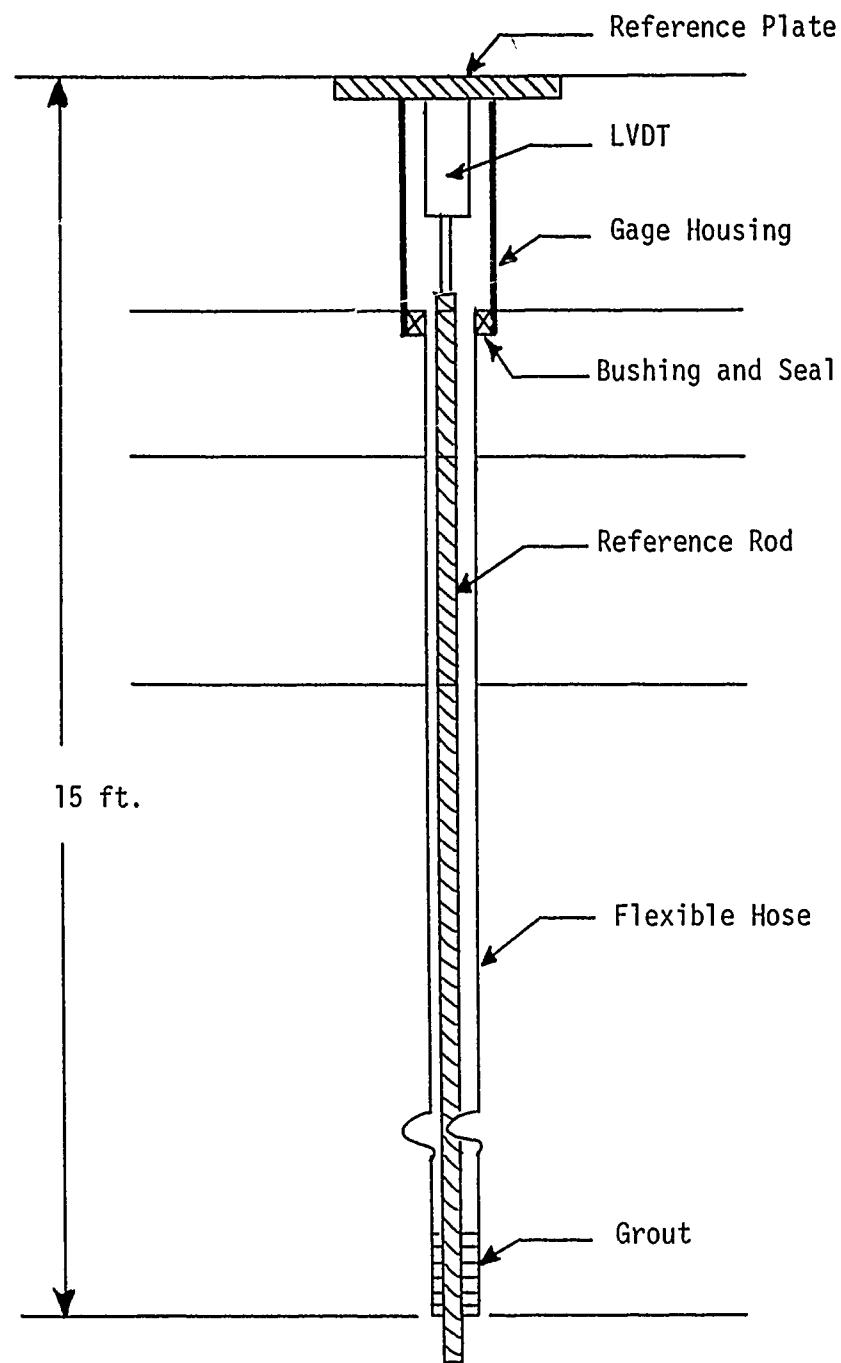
In-place LVDT installed on Runway 4R-22L at O'Hare International Airport.
